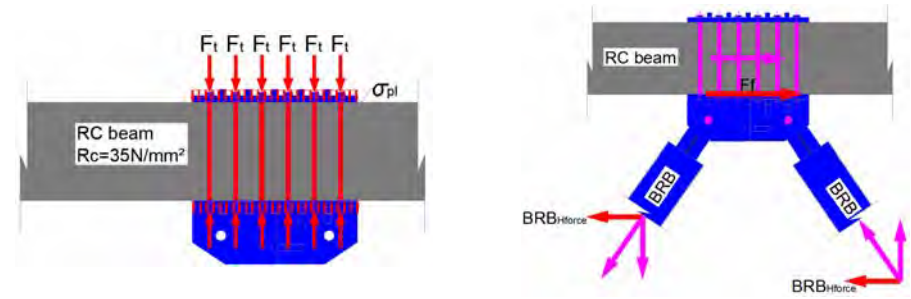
(a) RC beam – BRB connection: pressure under the steel plate due to bolts pre-stressing (b) Load transfer and forces on the upper connection.
